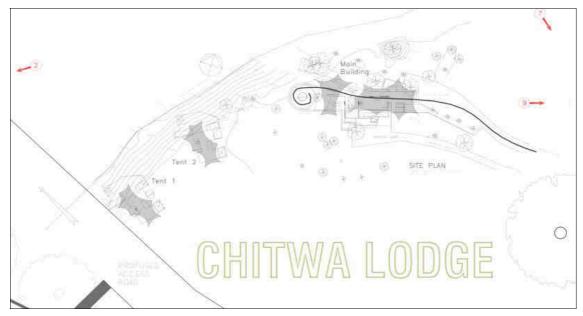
Concept drawing of Proposed Tented Lodge Layout.
